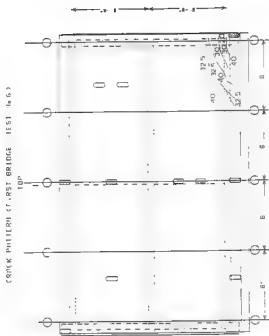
Top Cracking Pattern (First Bridge - Test No 6)
